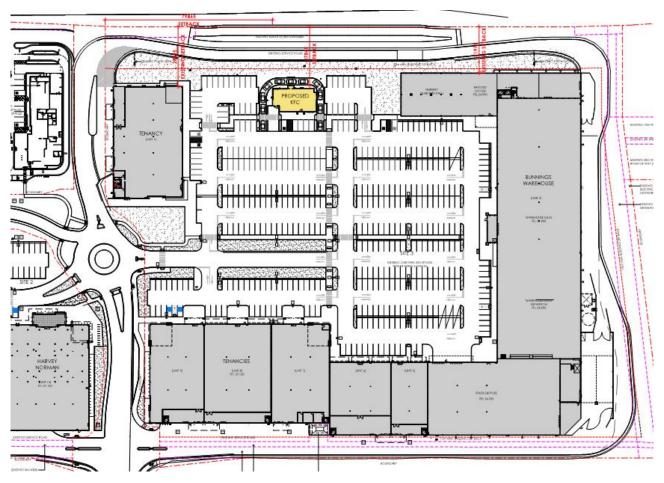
Proposed site plan (Source: Urbis report p. 93)
